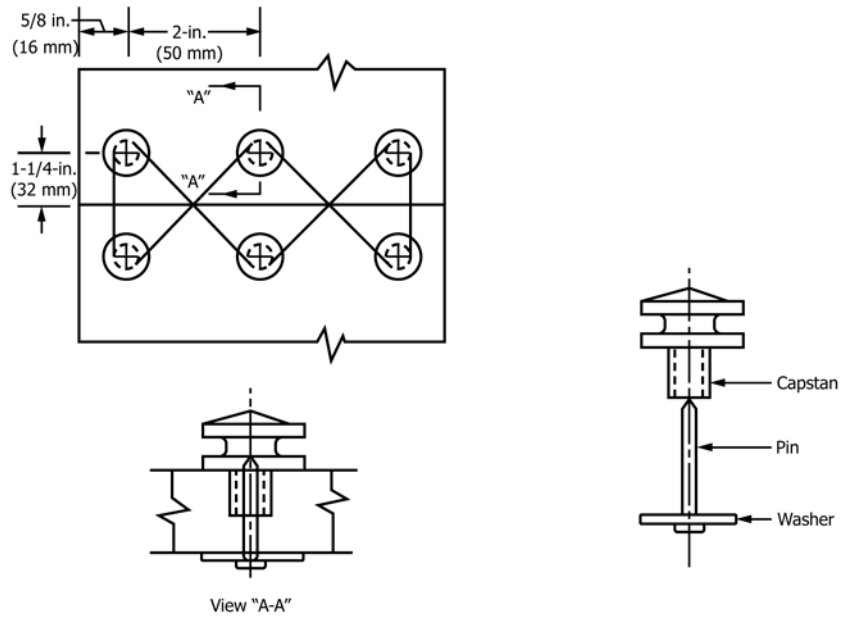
Alternate Method of Lacing Removable/Reusable Blankets Using Lacing Capstan Assembly Sets
